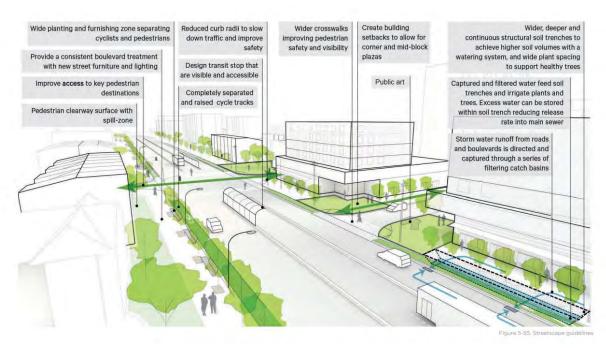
Dundas Connects Master Plan – Planned Streetscape For Dundas Street East
